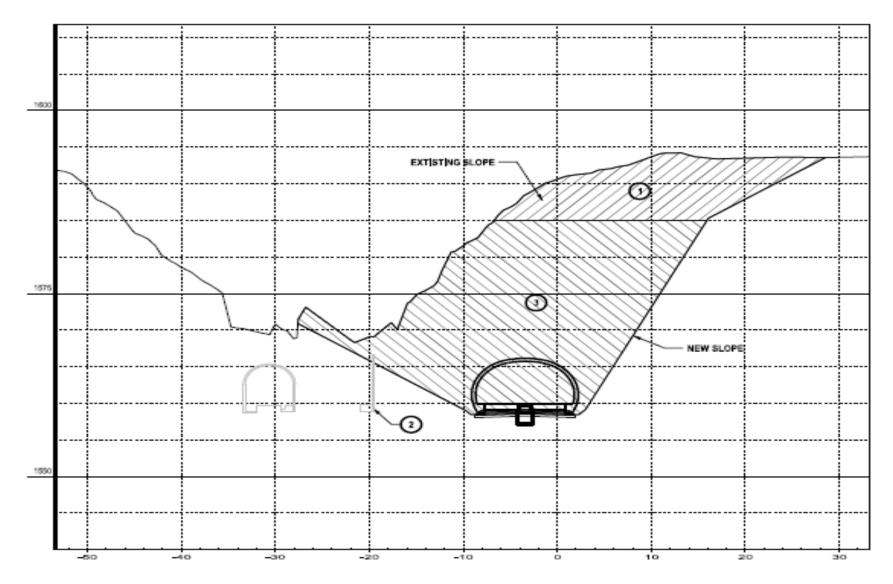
EXISTING AND NEW TUNNEL CROSS-SECTION AT EASTERN PORTAL (AURECON; 2014).
